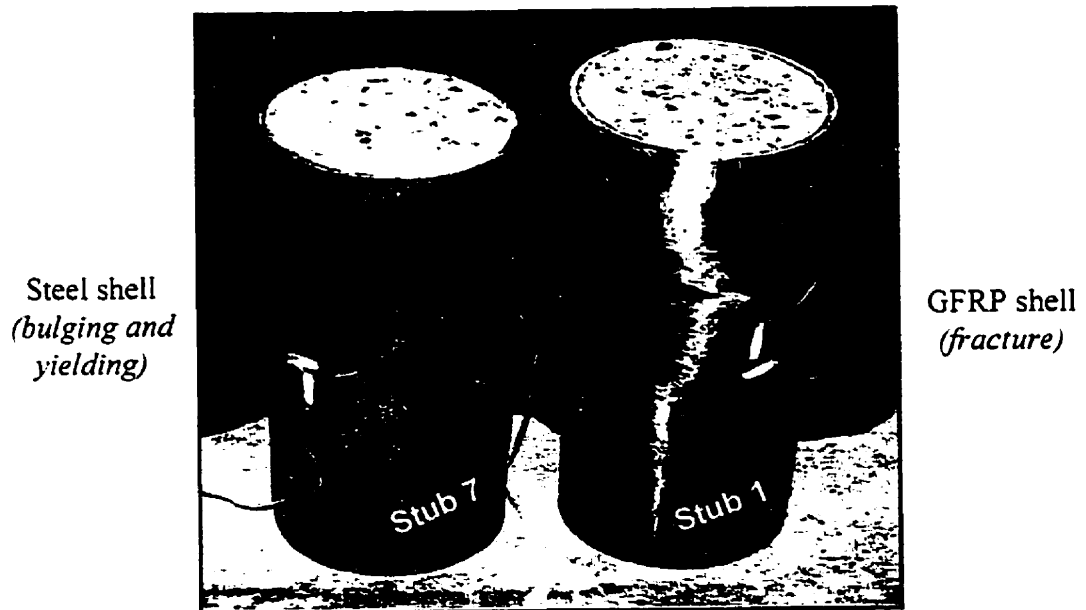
Failure modes of GFRP-confined concrete, stub 1, and steel-confined concrete, stub 7
